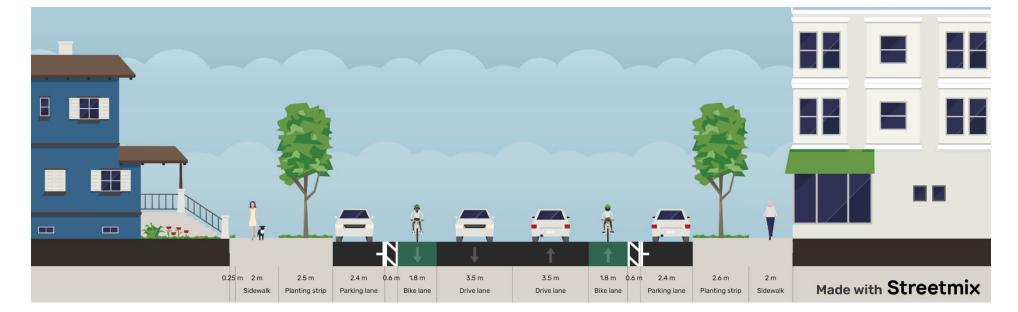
Collector (26 m Right-of-Way) On-Street Parking (Both-Sides) with Bike Lanes
